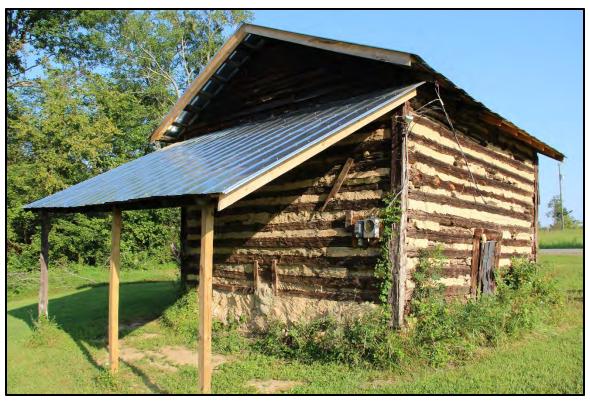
Architectural resource RK1744; view is northwest and features the south and east elevations.
